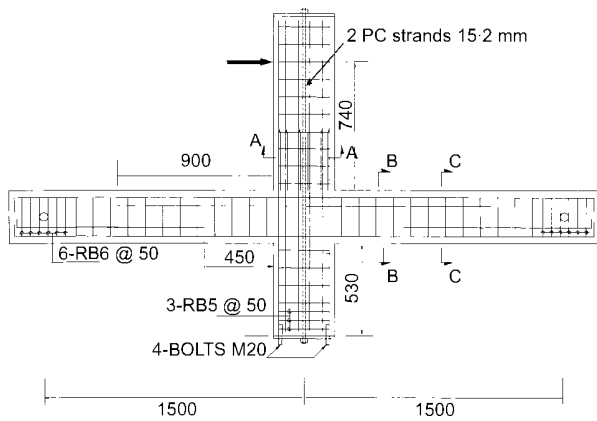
Geometry, dimensions and reinforcement of all specimens (unit: mm)
